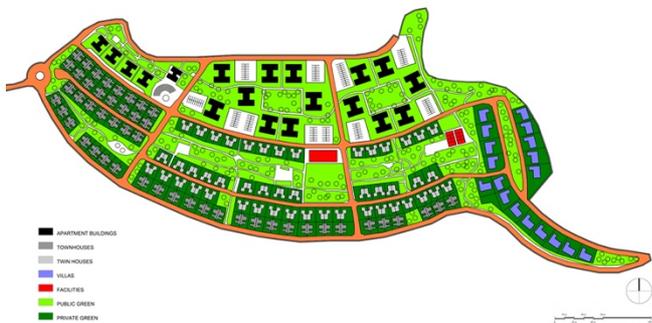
Kigali Vision settlement site layout. Drawing by Manlio Michieletto.
